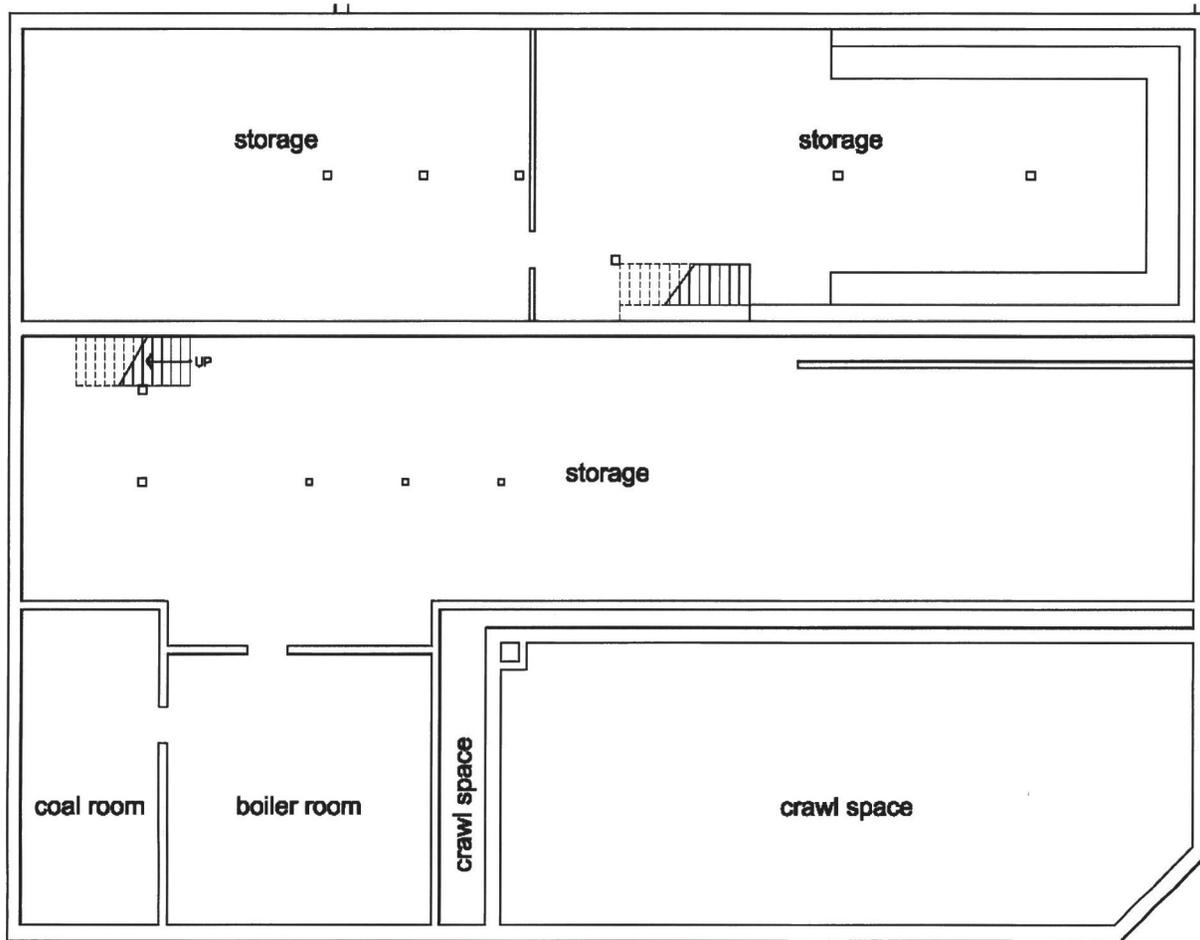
Basement Plan Pre-Rehabilitation – Plan by APMA March 2010 – not to scale.
